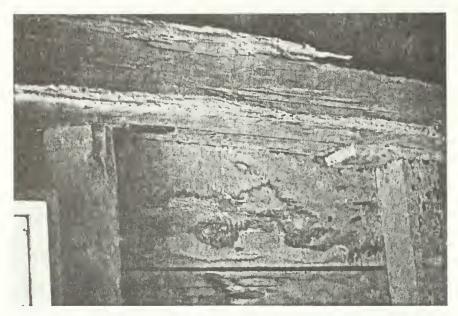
West India Goods Store, interior of second story, south wall, showing girt with vacant stud pocket and two studs in nonhistoric positions. The stud on the right is in the approximate center of the south wall.
